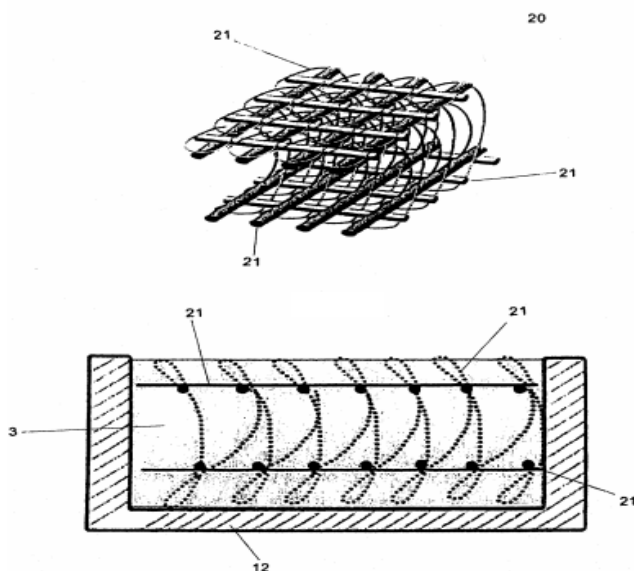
Manufacturing transparent concrete (<http://theconstructor.org/concrete>)
